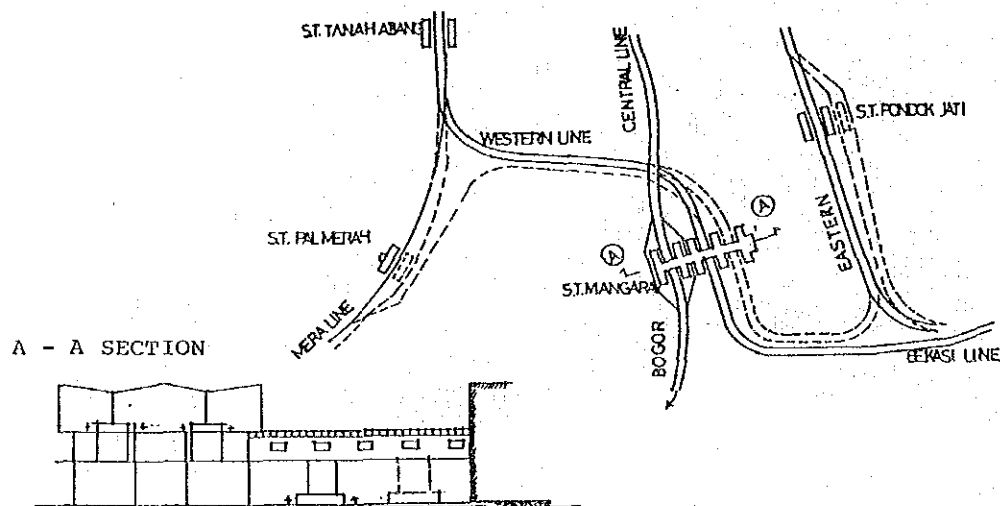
TENTATIVE PLAN FOR ELEVATION OF RAILWAY TRACKS AT THE MANGGARAI STATION
